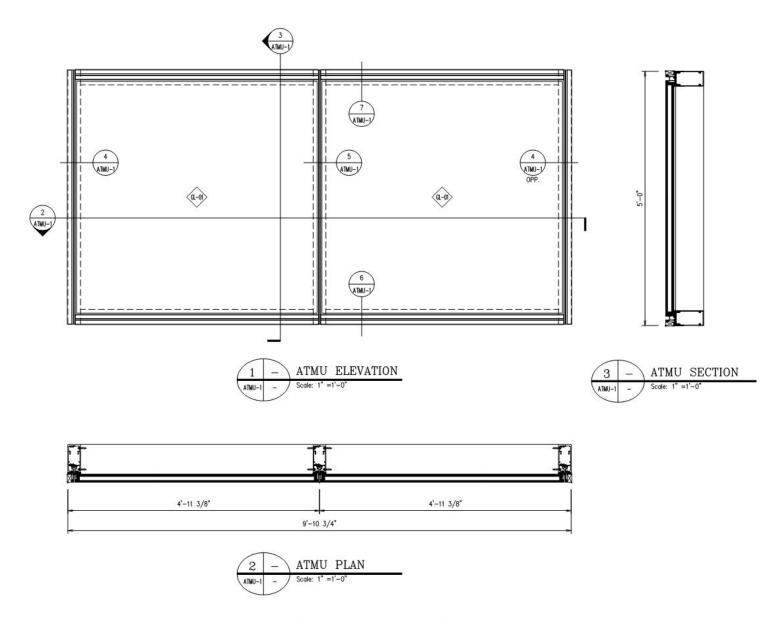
UNITIZED CURTAIN WALL SYSTEM SHOP DRAWINGS (COURTESY OF ENCLOS CORP), PLAN AND ELEVATION
